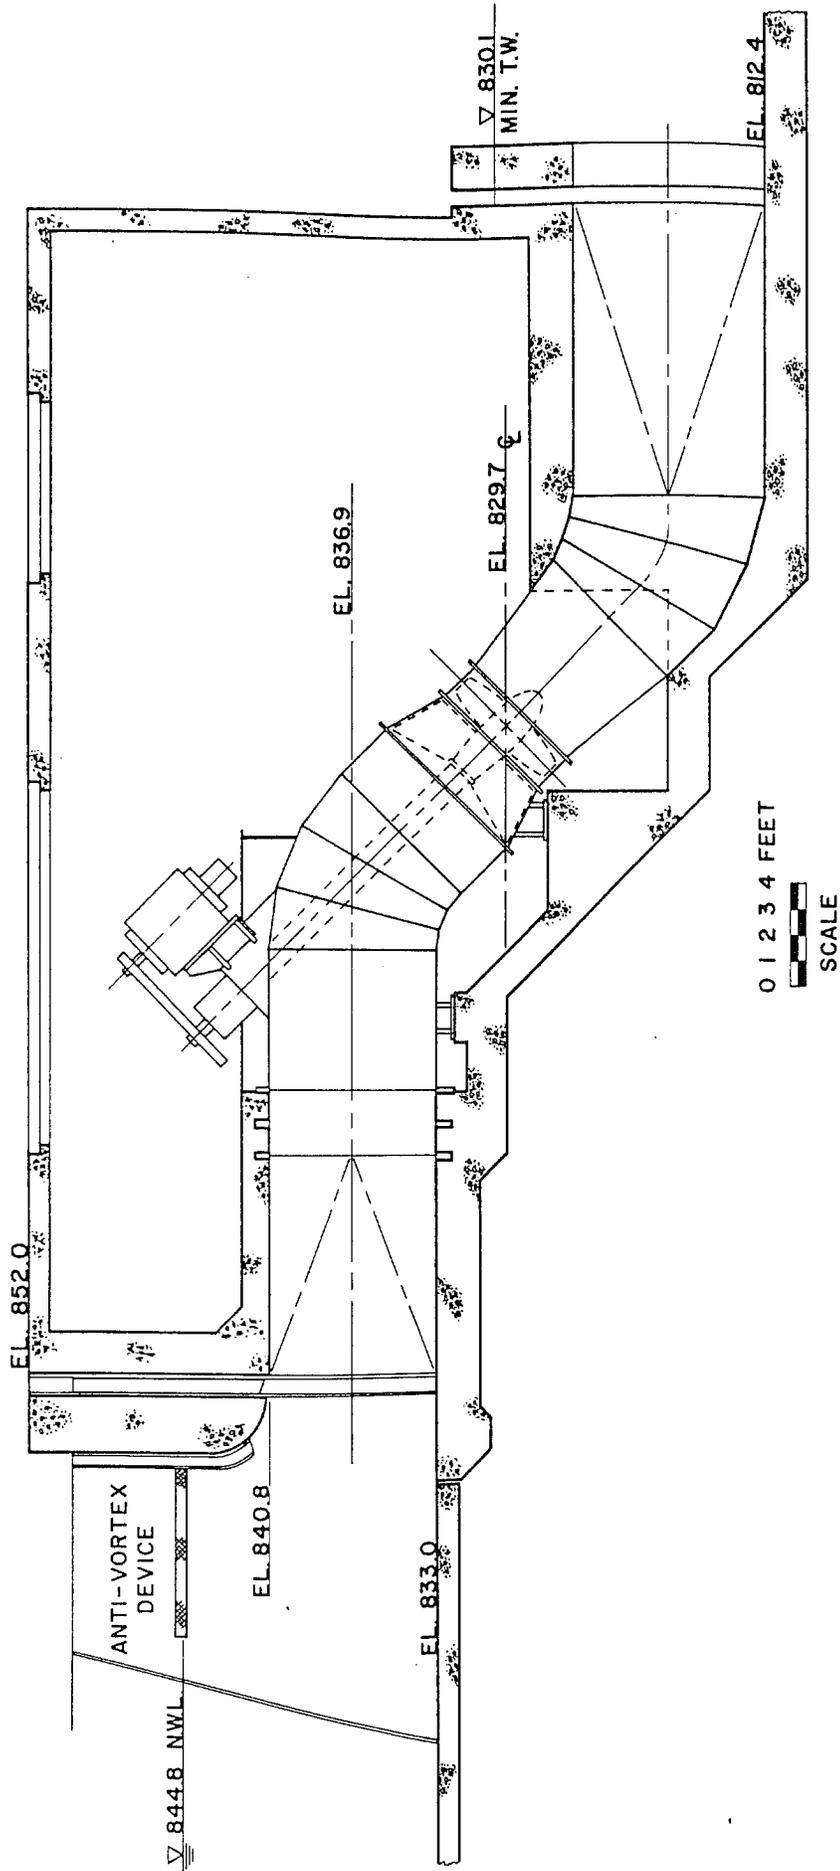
Section view of 72 in. runner diameter unit for Alternative B with generator output is 375 kW at 460 cfs discharge and 12.3 feet net head.
